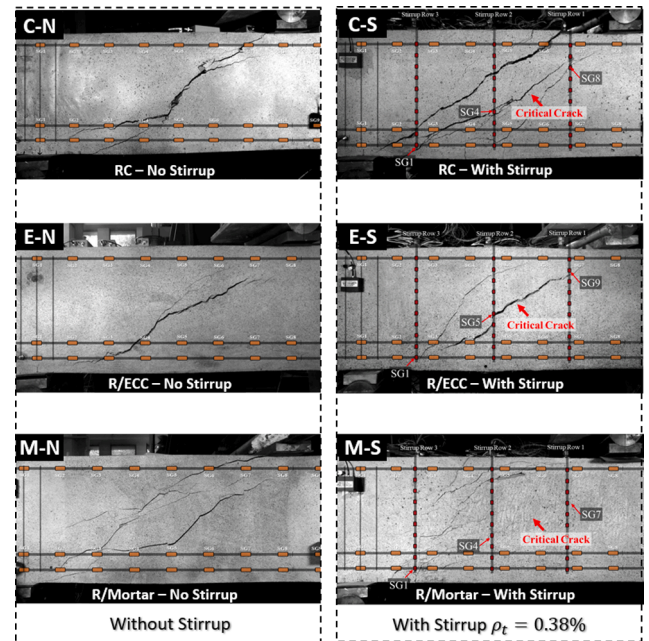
Crack pattern at ultimate failure for beam specimens.
